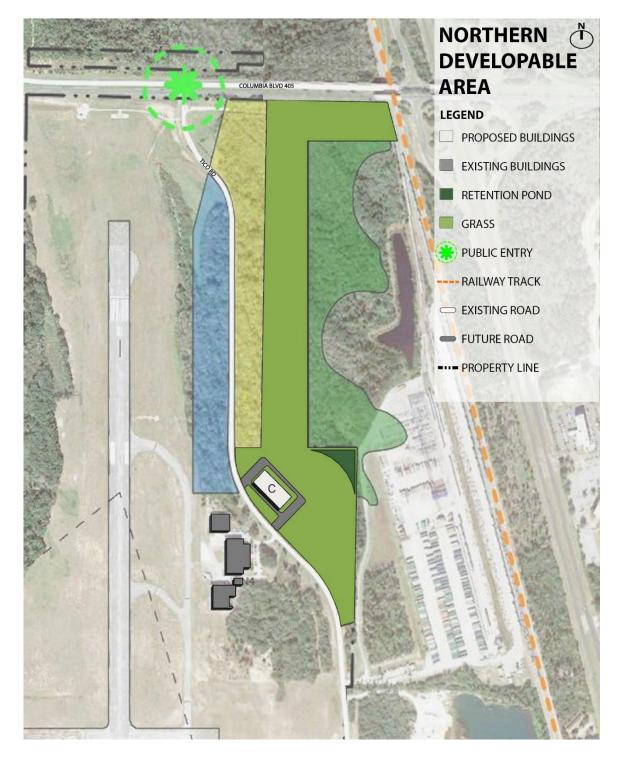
Area Development-Proposed DevelopmentNear Northern Campus Entrance - Existing Road
